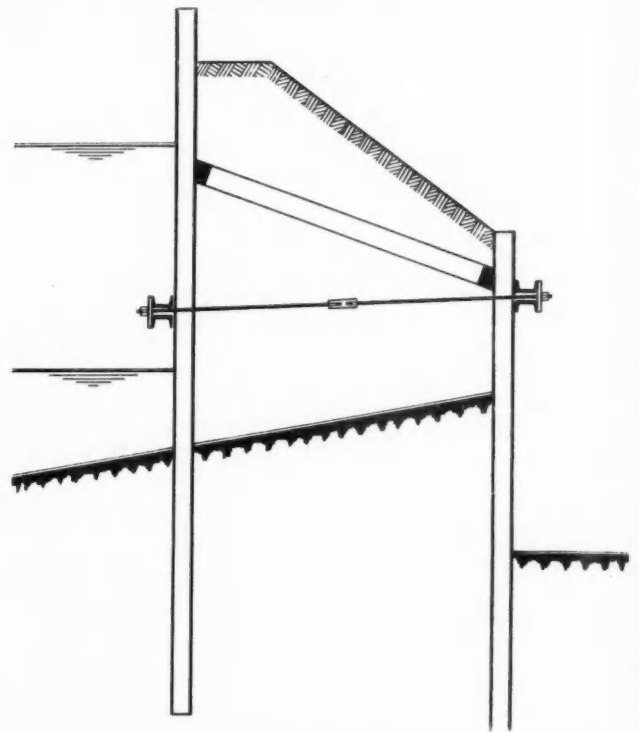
Cofferdam formed of two walls of steel sheet piling.
